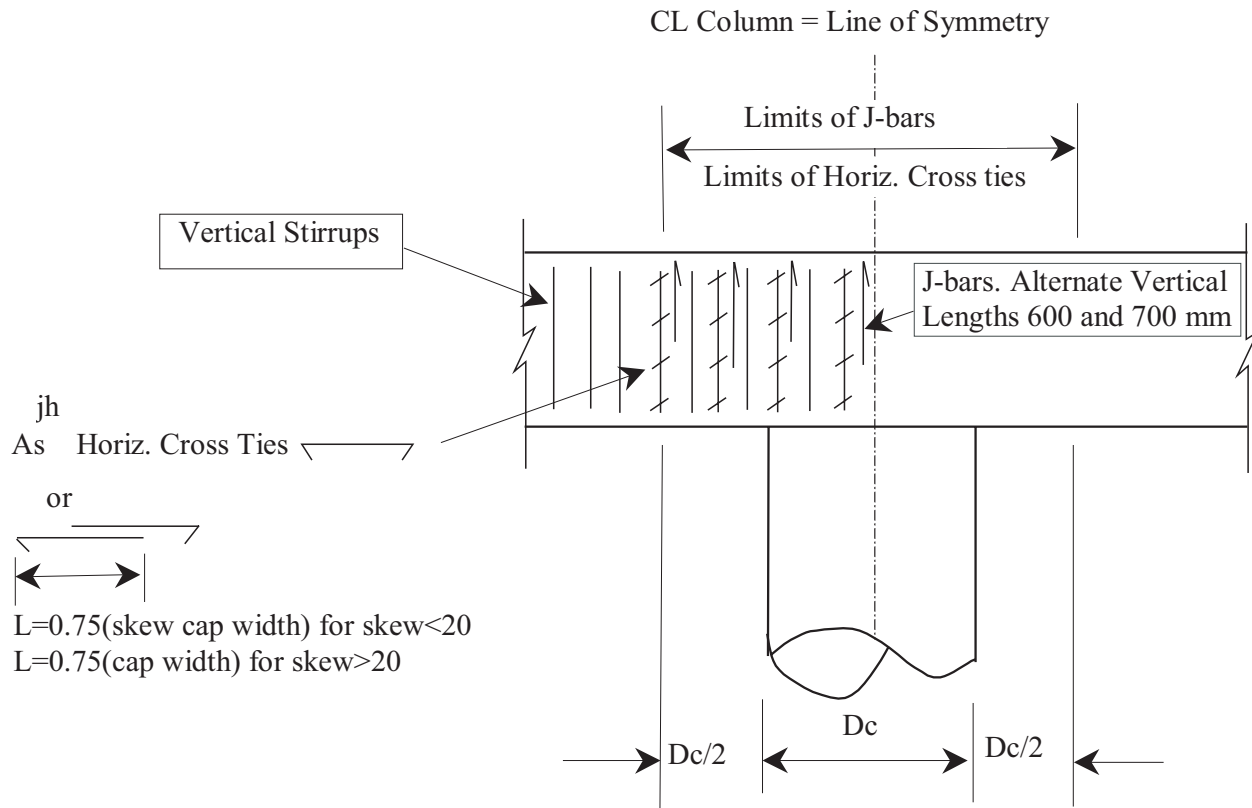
Joint Shear Reinforcement Details<sup>11</sup>
